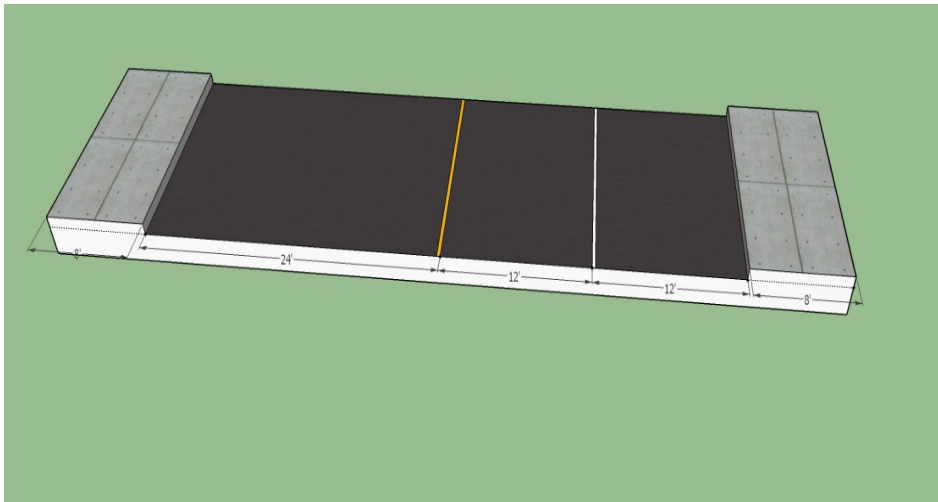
Current design of Maynard Terrace bridge over I-20 between East Atlanta and Kirkwood, looking northeast
